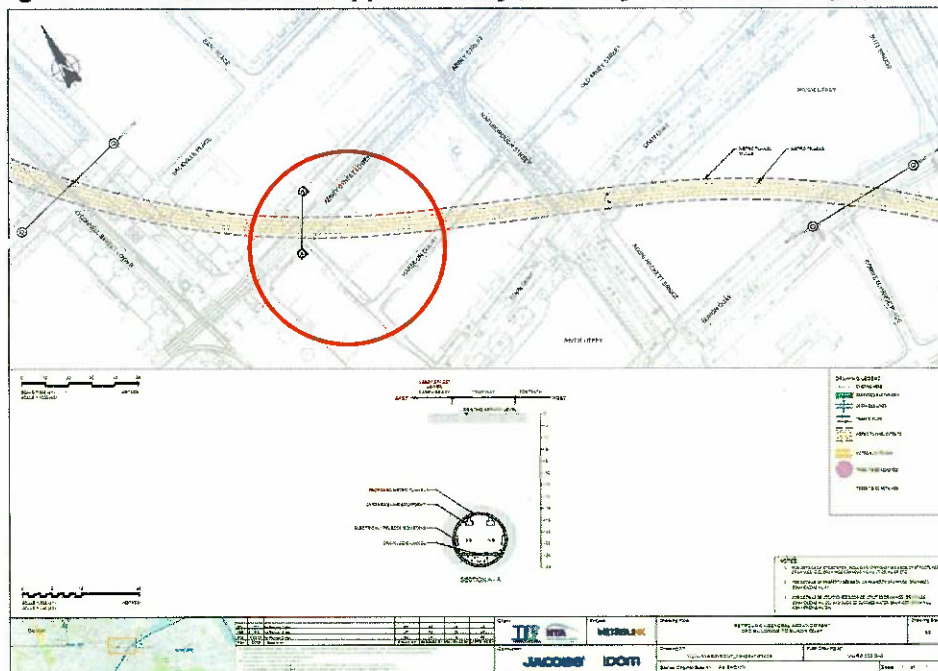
Alignment of the MetroLink directly under the subject site (Source: metrolink.ie) ref: ML1-JAI-ARD-ROUT_XX-DR-Y-03089
